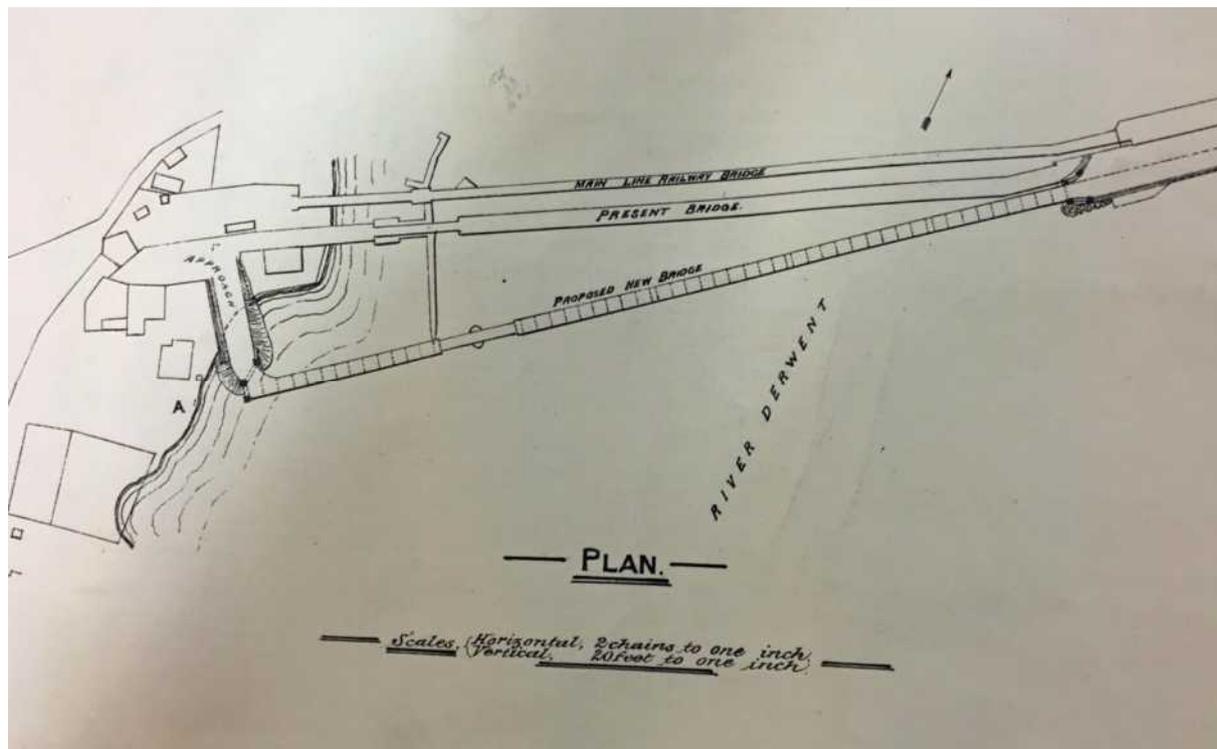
1890 plan showing the 1849 road bridge (centre), 1874 rail bridge (top) and the proposed 1893 road and rail bridge (bottom). North to left of image (TAHO, P1330/1/303, Plan 8844122 (12910) TGR - Bridge over River Derwent At Bridgewater - site plan (sheet 1) [lithograph])
